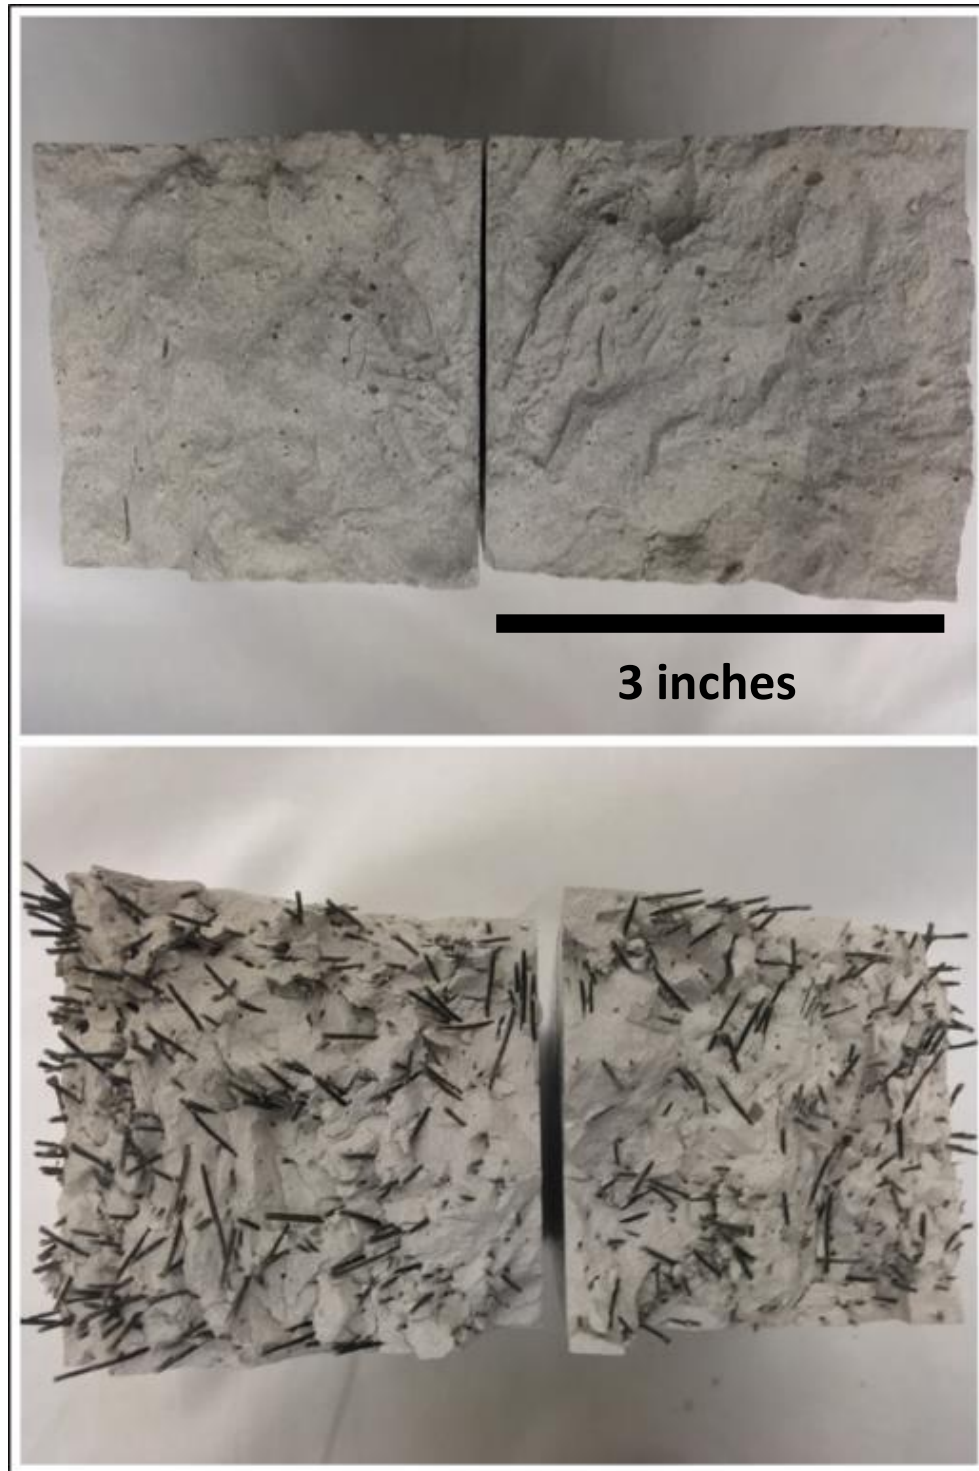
Fracture surfaces for (top) KGPF and (bottom) KGPMB. Tension surfaces are centered in the images, while compressive surfaces are on the edges.
